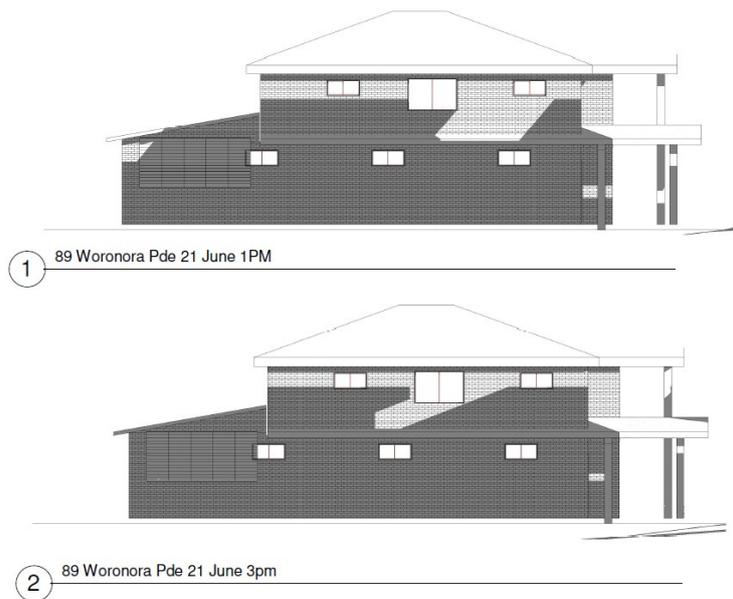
Elevational Shadow Diagram 1/3pm 89 Woronora Parade (Source: ARC Homes)
